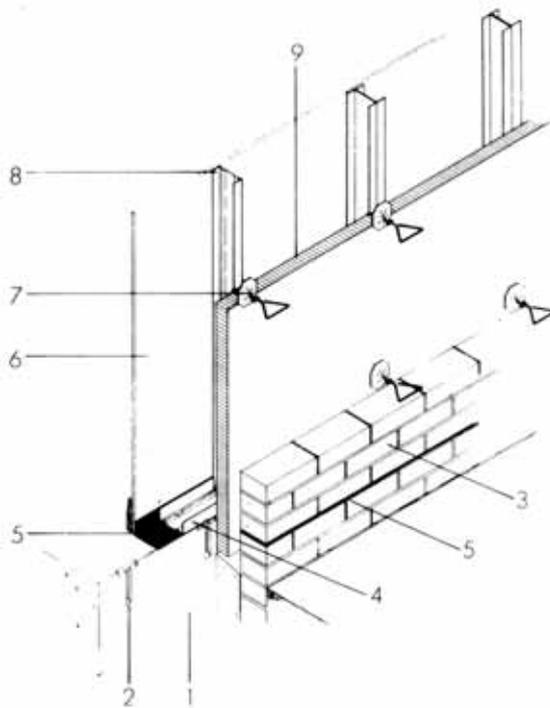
Section detail of brick wall system attachment to LGSF system
